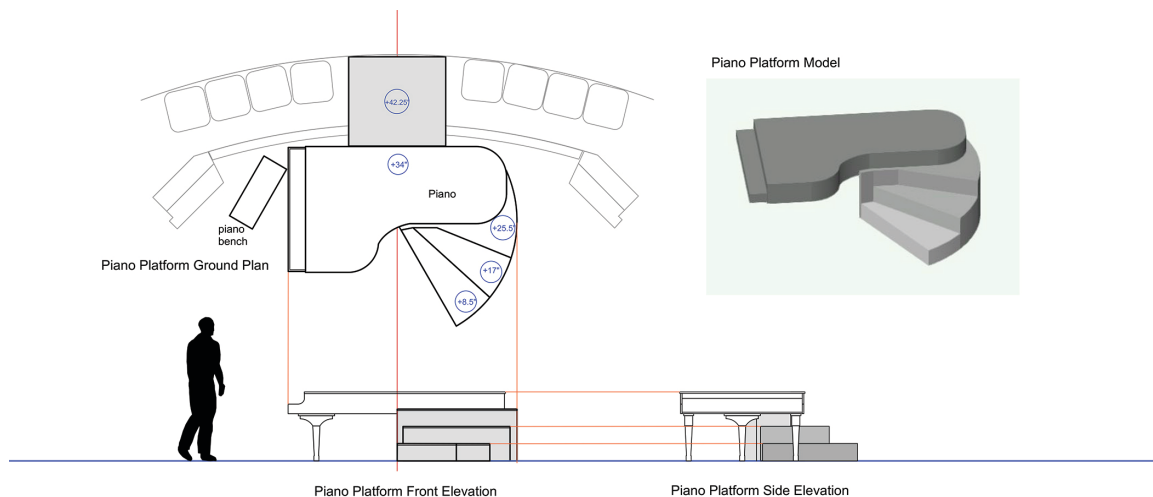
Much Ado About Nothing* shop drawing details for Don John's piano.
